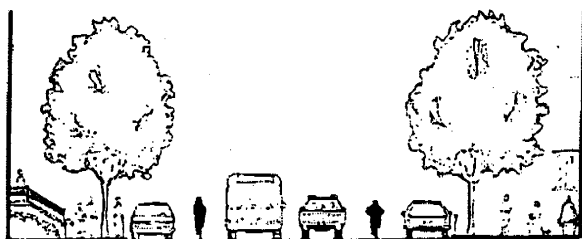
Cross-section of a bike lane between travel lanes and on-street parallel parking
